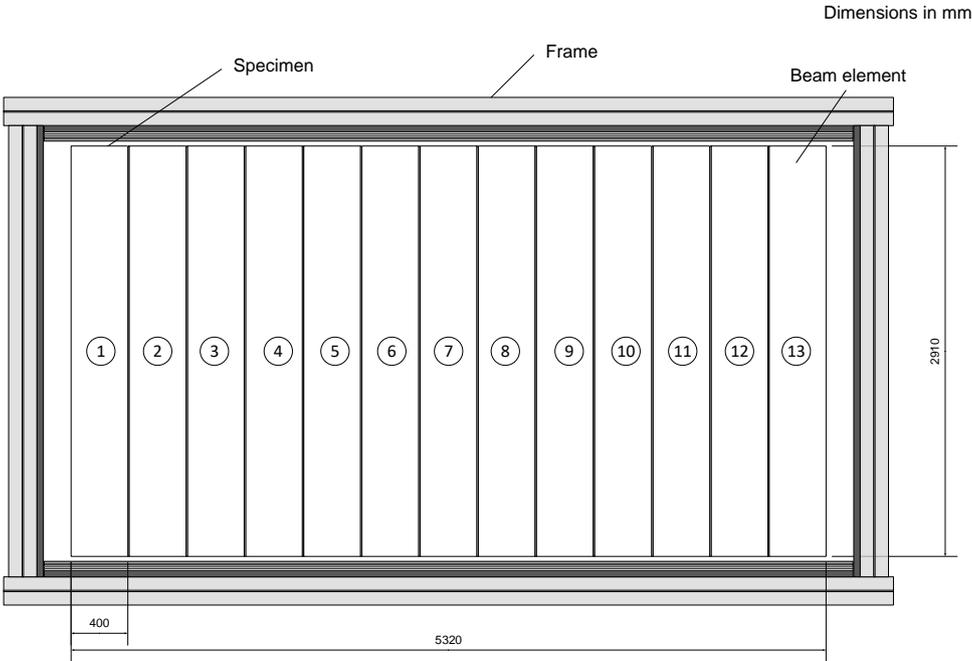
Test specimen assembled out of beam elements and the metal frame with fitting layers.
